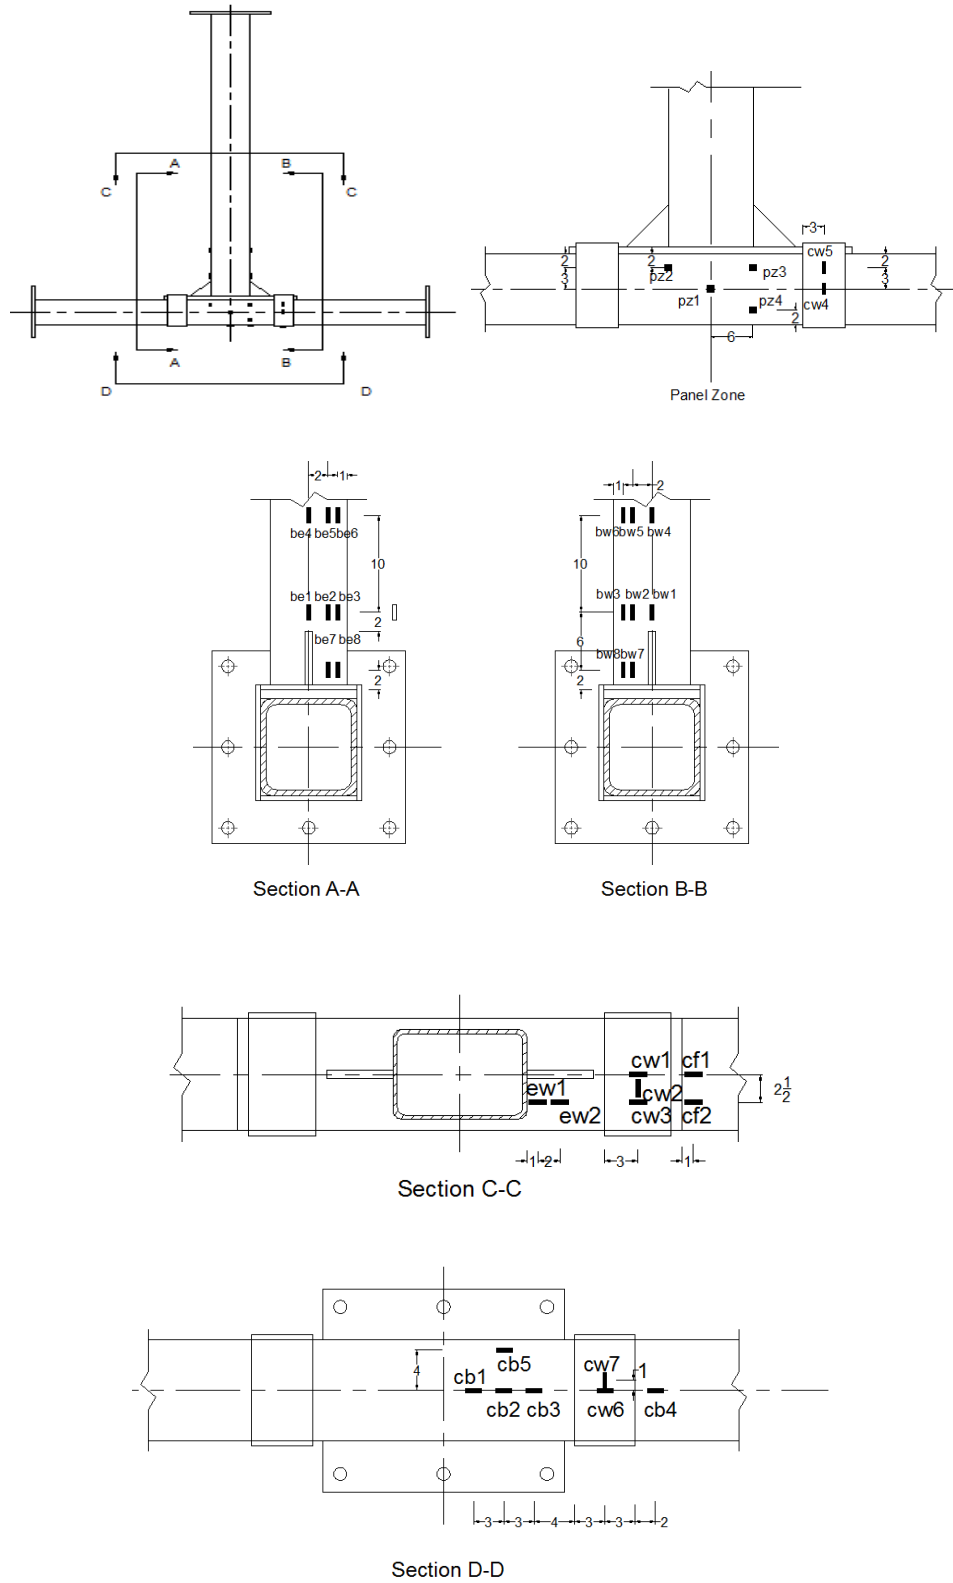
Strain Gage Locations for the Connection with Stiffeners (units in inch)
